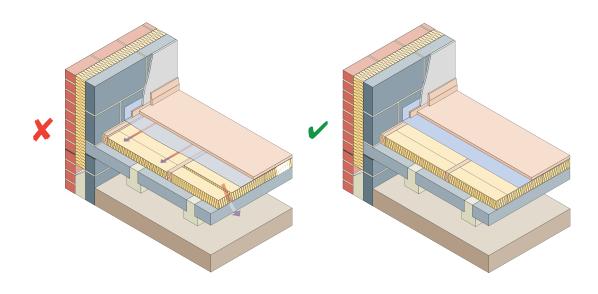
To avoid heat losses through the vented, suspended beam and block floor construction, ensure the insulation is in full contact with the underside of the floor deck and insulation boards are tightly butted together. The perimeter deck fixing battens should preferably be insulated to enhance thermal performance of the floor. To ensure continuity of the building's airtightness, the air barrier should be turned up at the perimeter wall and overlapped by the plaster finish.
